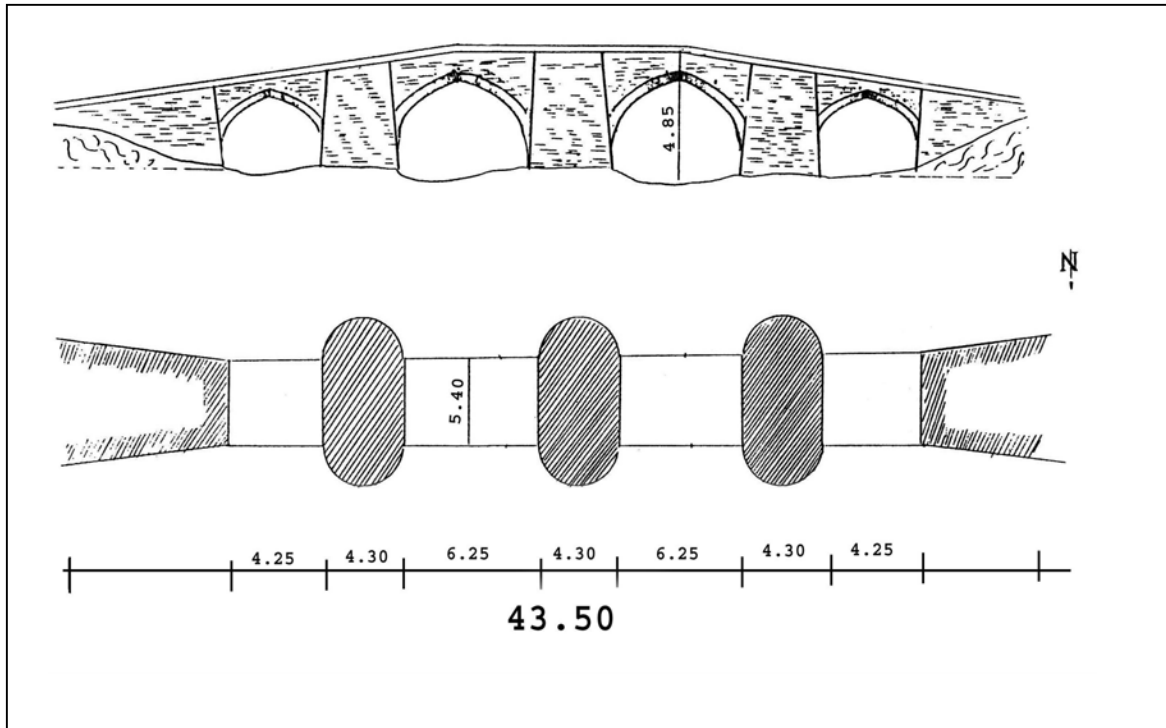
Plan and view of Shekasteh Bridge, Asad Abad
